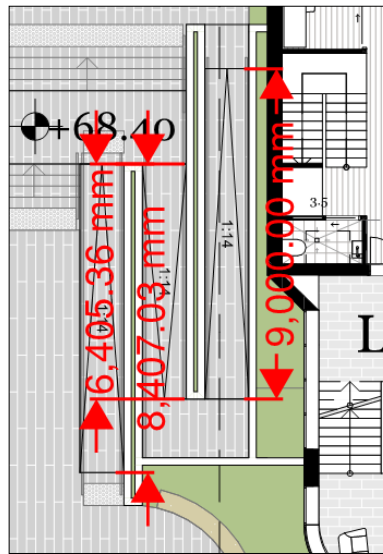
STAGE 02 Ground Floor: Proposed Entrances to Building
